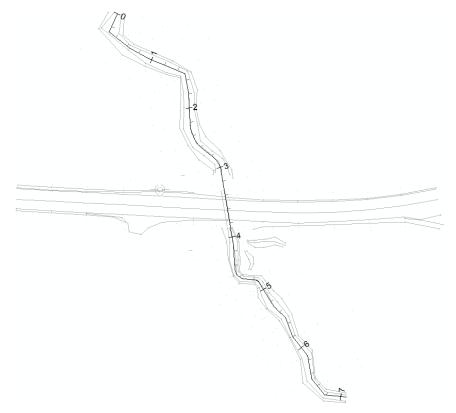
Longitudinal profile stationing for existing and proposed conditions
